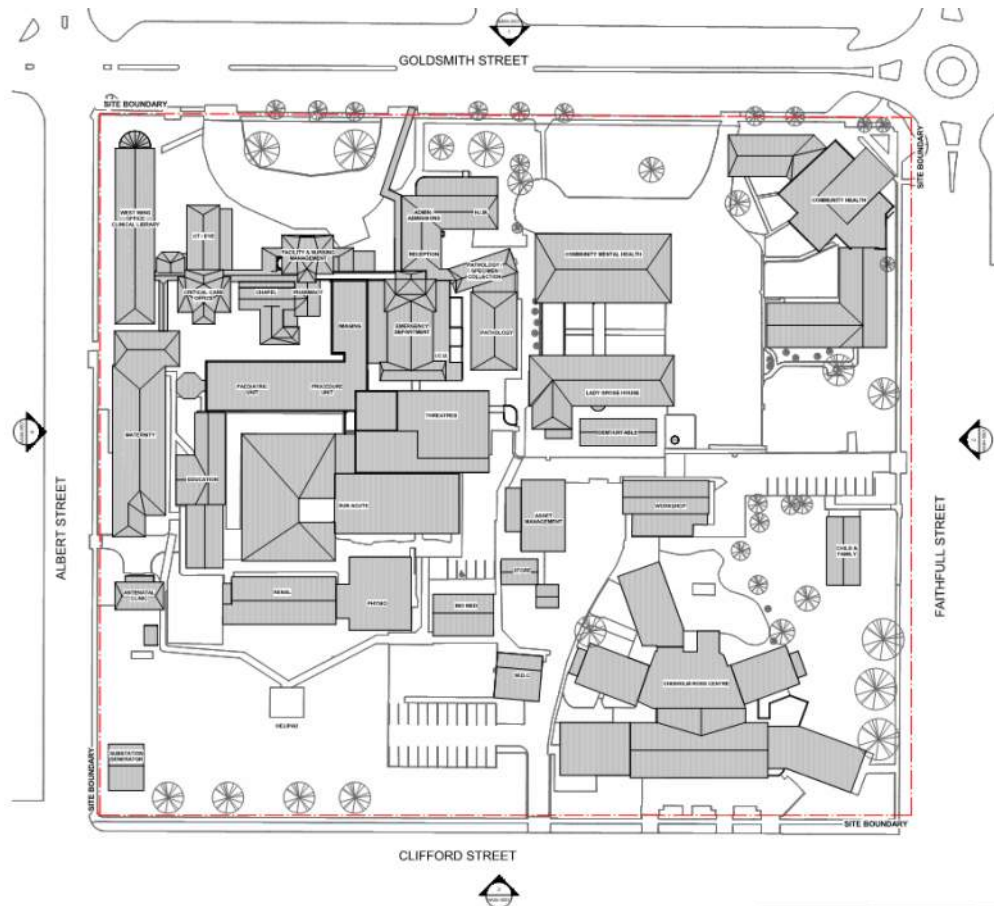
Existing Site Plan of GoBH (Source: BLP)
